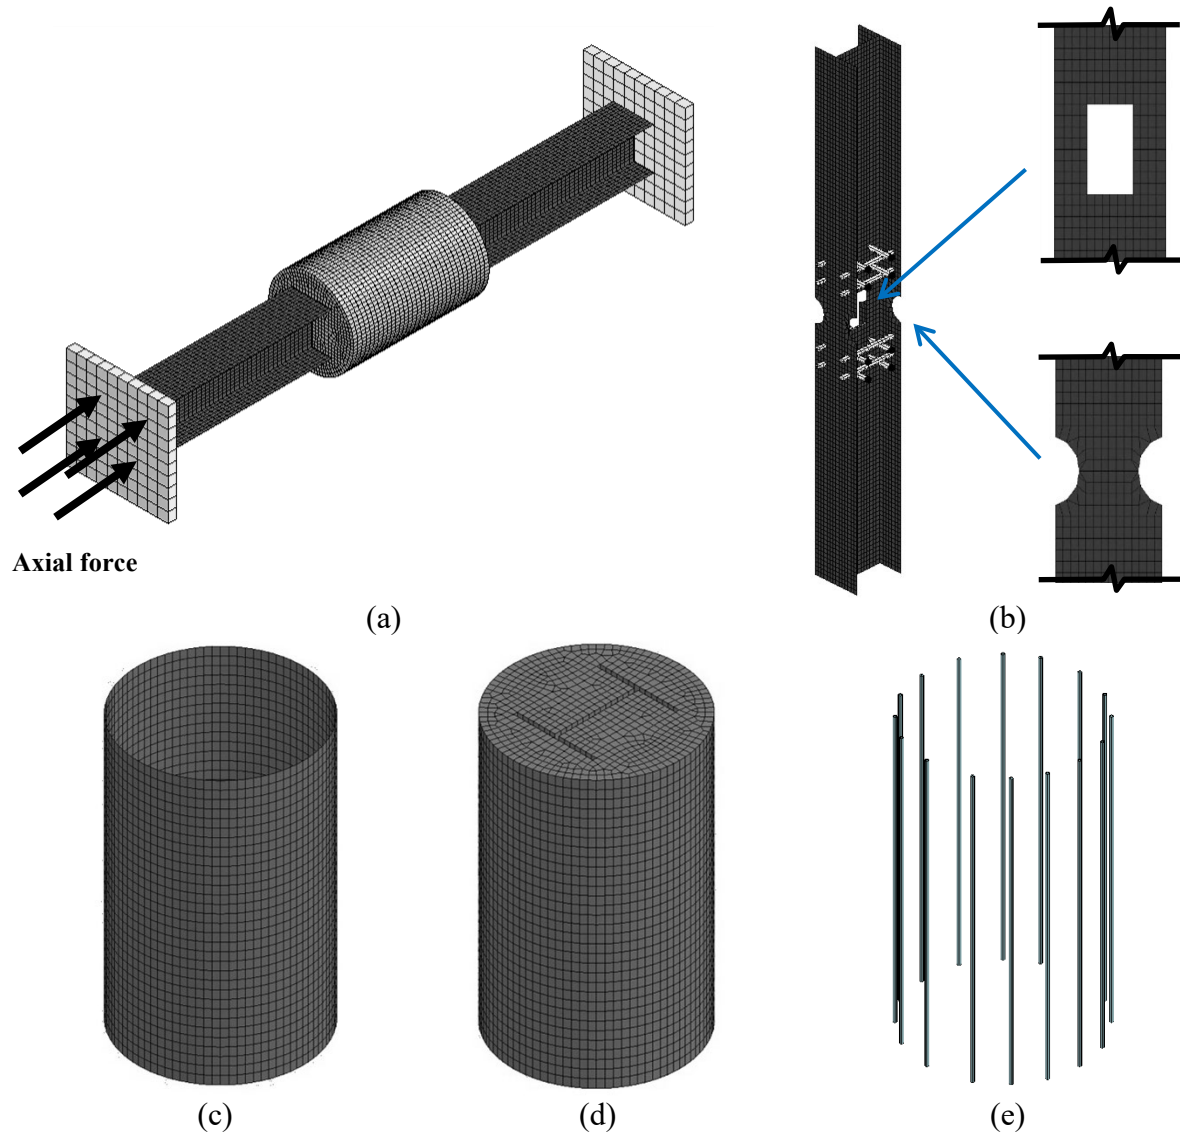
FE modeling: (a) 3D view of the repaired steel pile, (b) steel H-pile, (c) CFRP tube, (d) concrete filling, and (e) steel rebar.
